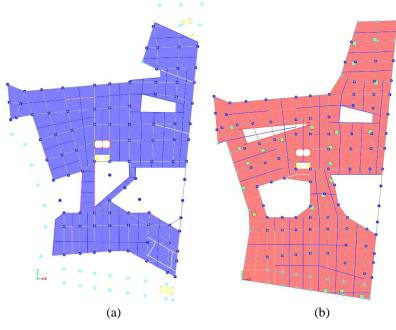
Floor plan of the building (a) Level 1 and (b) Level 2.
